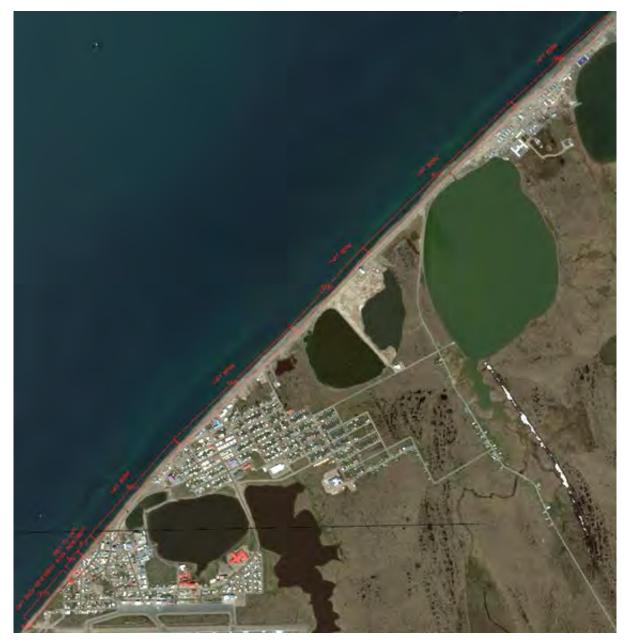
Alternative 2a: Rock Revetment at Bluff and Berm in Front of Stevenson Street.
